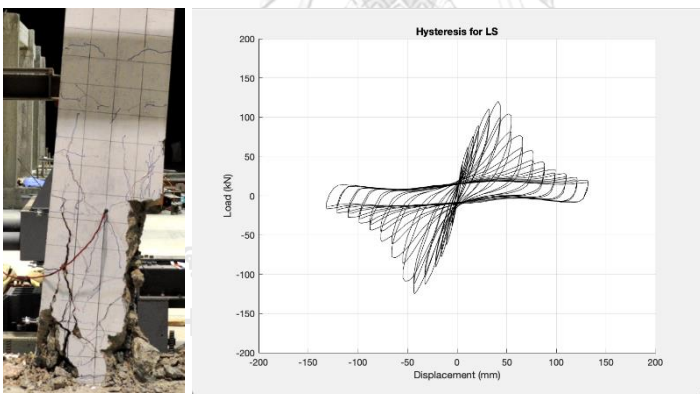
Bond slip failure of lap-splice column specimen LS
